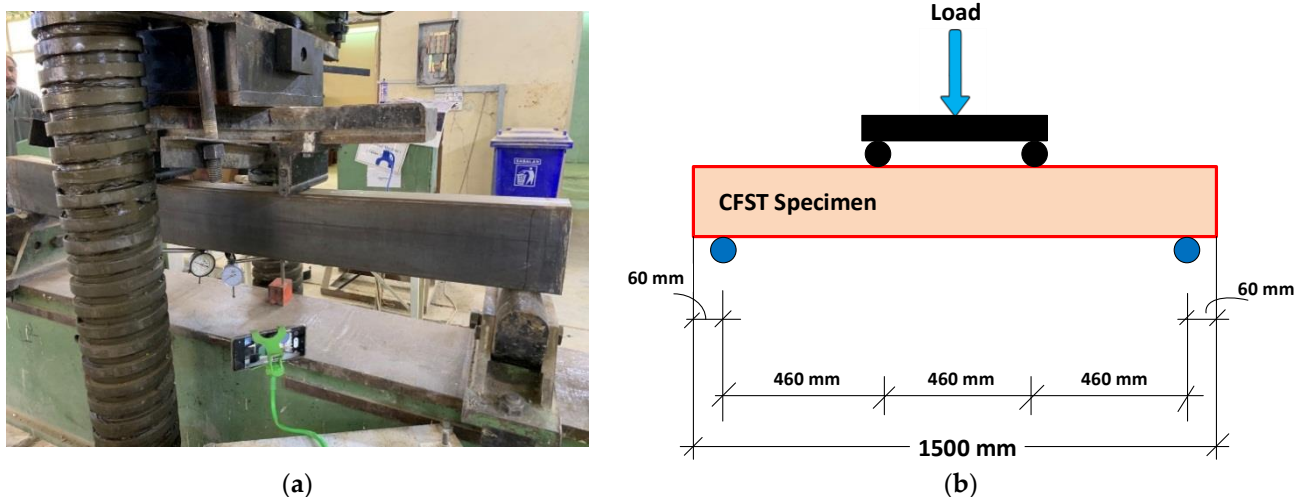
Test setup for the tested specimens. (a) Layout of the sample testing setup, (b) sample layout and loading position.
